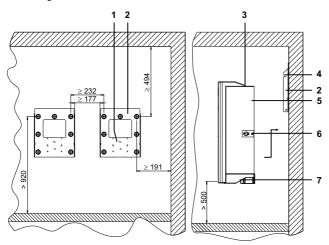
Spacing for position of mounting fixture (indications in mm)
